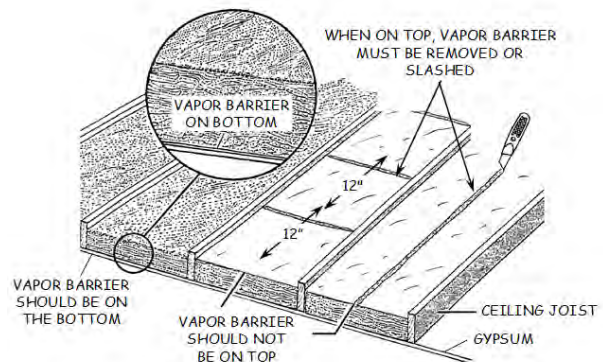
INSTALL VAPOR BARRIER TOWARD WINTER WARM SIDE AND CORRECT IMPROPER INSTALLATION
